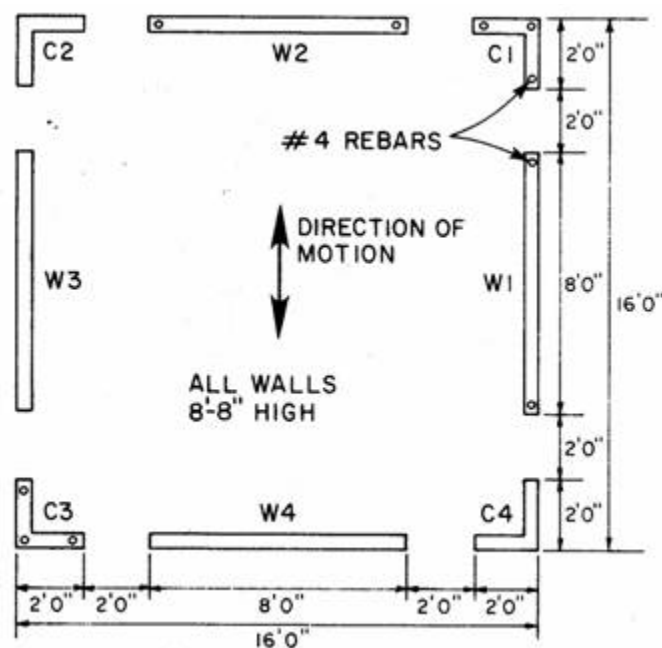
Plan view of House 1 (taken from Clough et al., 1979).
